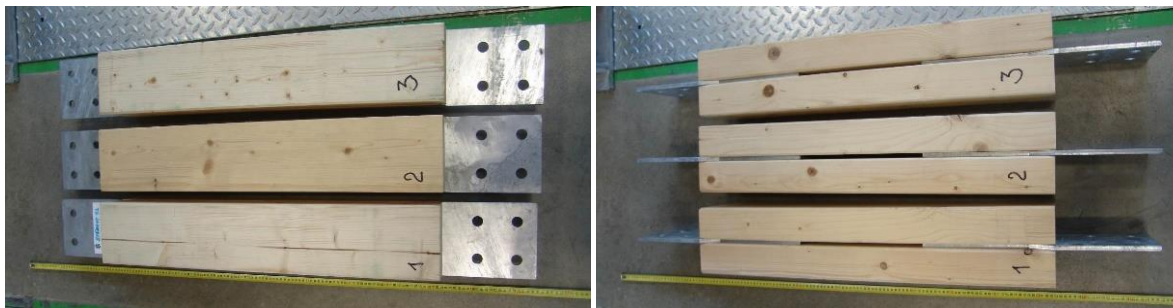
View of test specimens V1, V2, V3 – specimens of joints with the inserted MKD nail plates between timber prisms.
